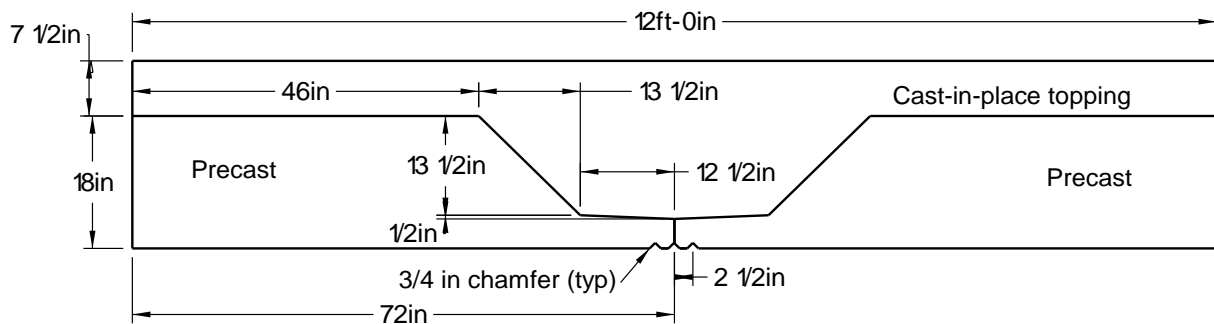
Cross-sectional Geometry of No-Connection Detail Test Specimens
